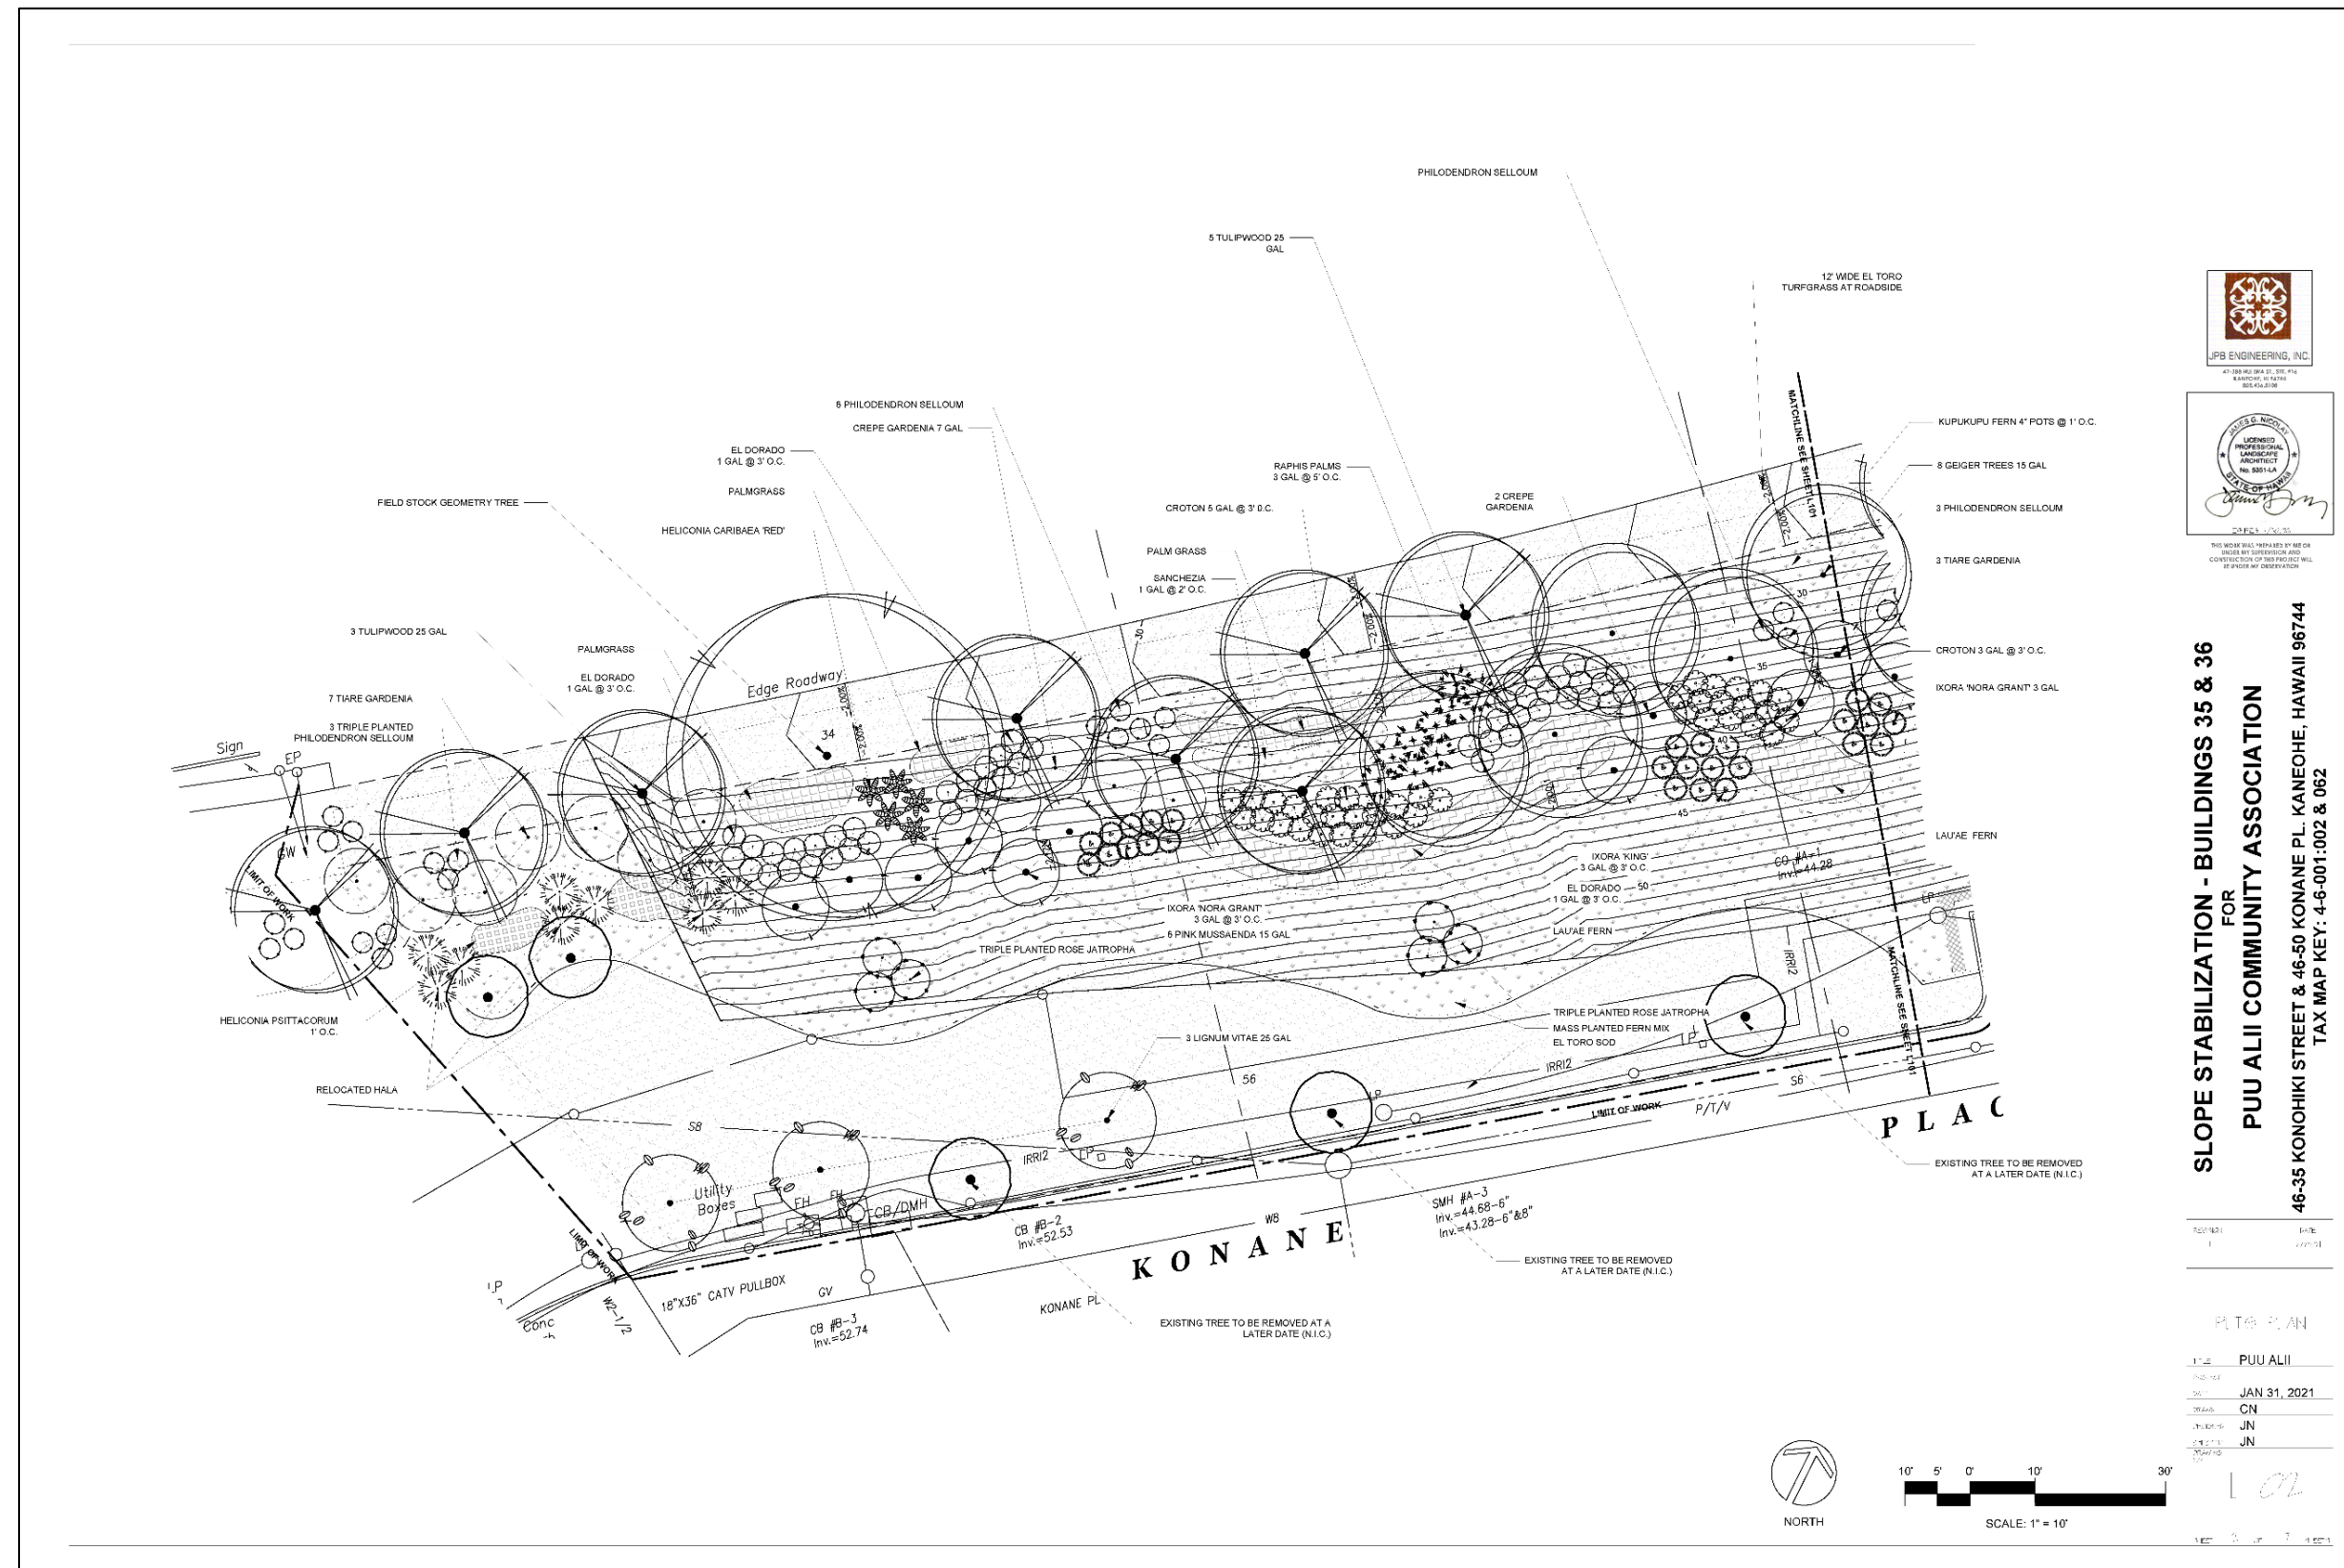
Planting Plan for the South Zone: 1 of 2
